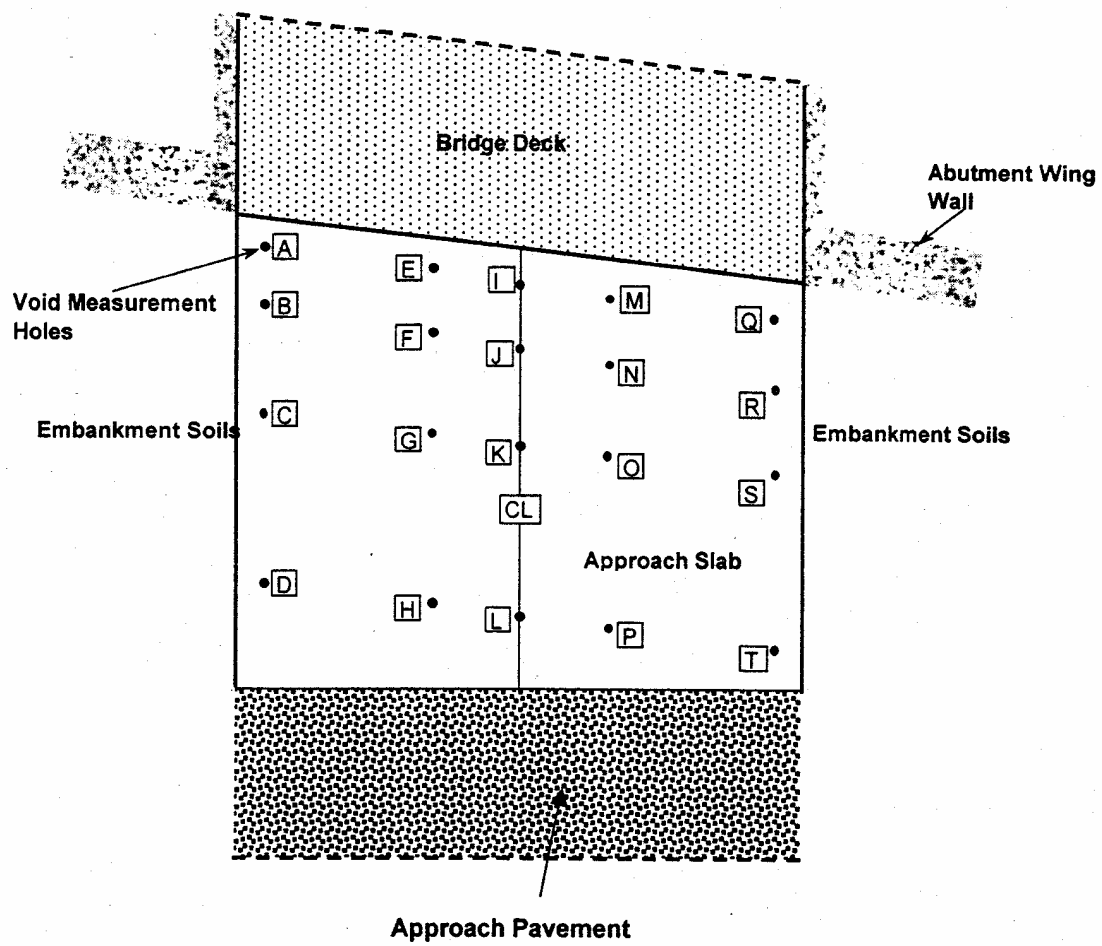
Void development hole locations for the north and south approach slab of the White River Bridge
